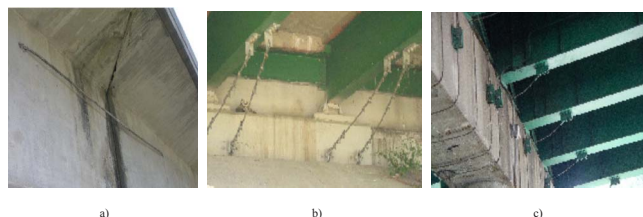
Restrainer cables (a) in Kentucky connecting two adjacent girders; (b) in Tennessee (SR59 over I-40) connecting girders to the abutment; and (c) in Illinois attached to girders and wrapped around bent beam
